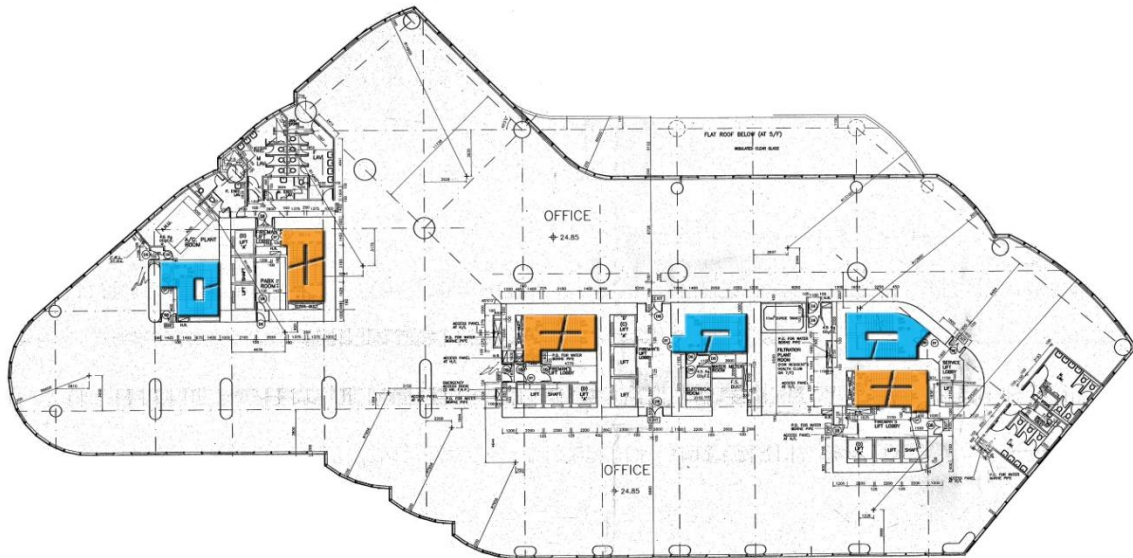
Podium stairwells; blue stairs only service the podium and orange stairs service the whole building. (DLN Architects & Engineers 2001c)
